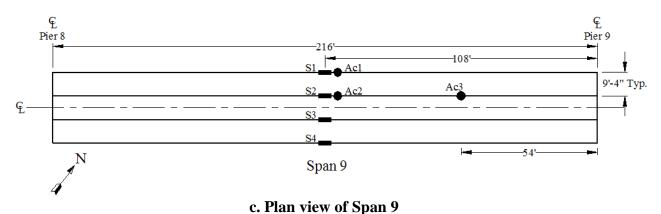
Instrumentation plan for the Saylorville Reservoir Bridge
